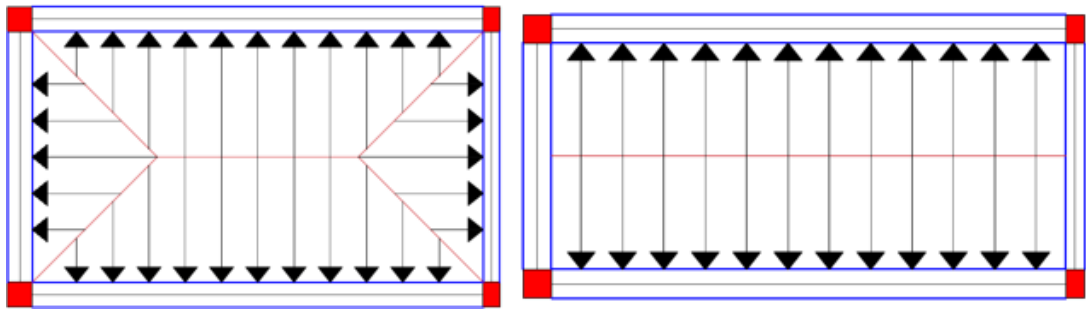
Load distribution in Two-Way Slab (left) and One-Way Slab (right)
